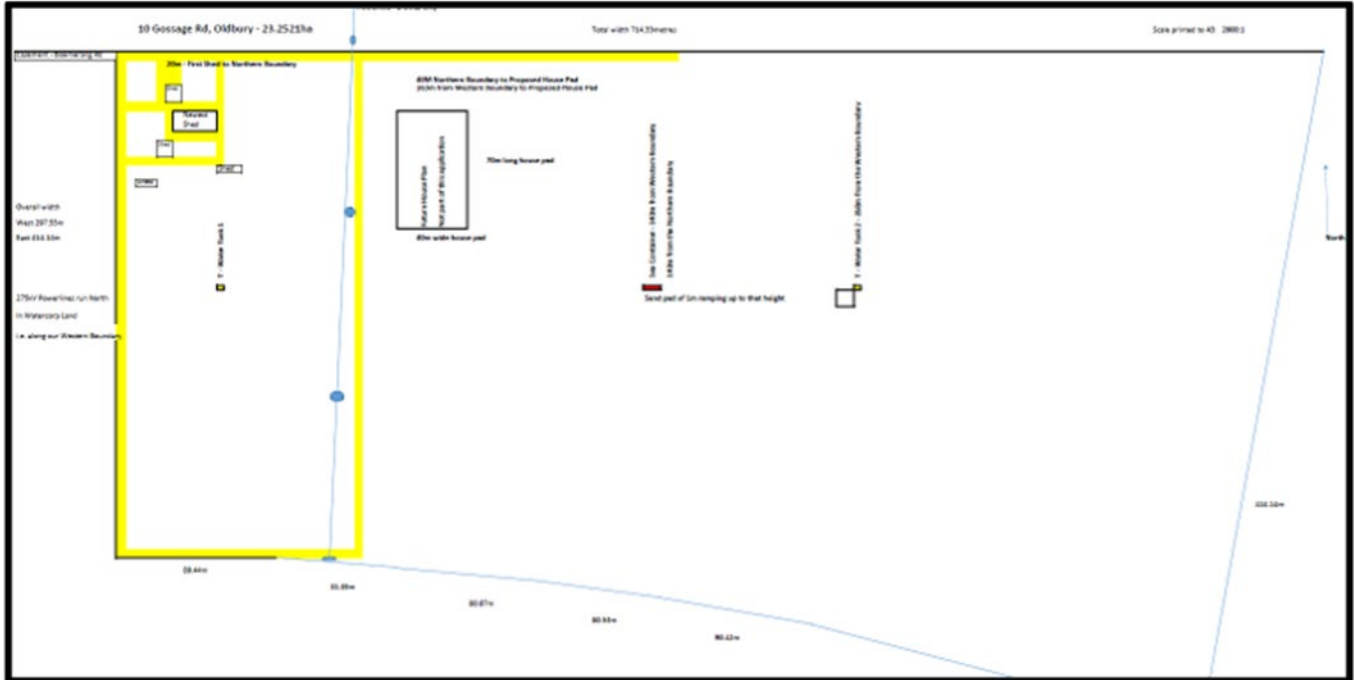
Site plan showing the extent of the retrospective fill in yellow
